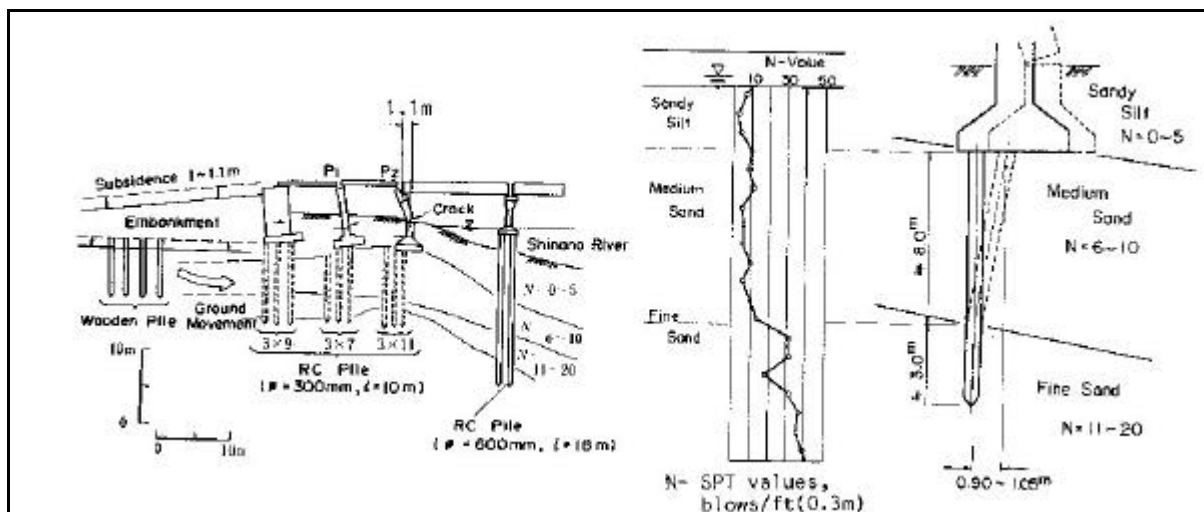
Failure of Yachiyo Bridge after Hamada (1992a).
